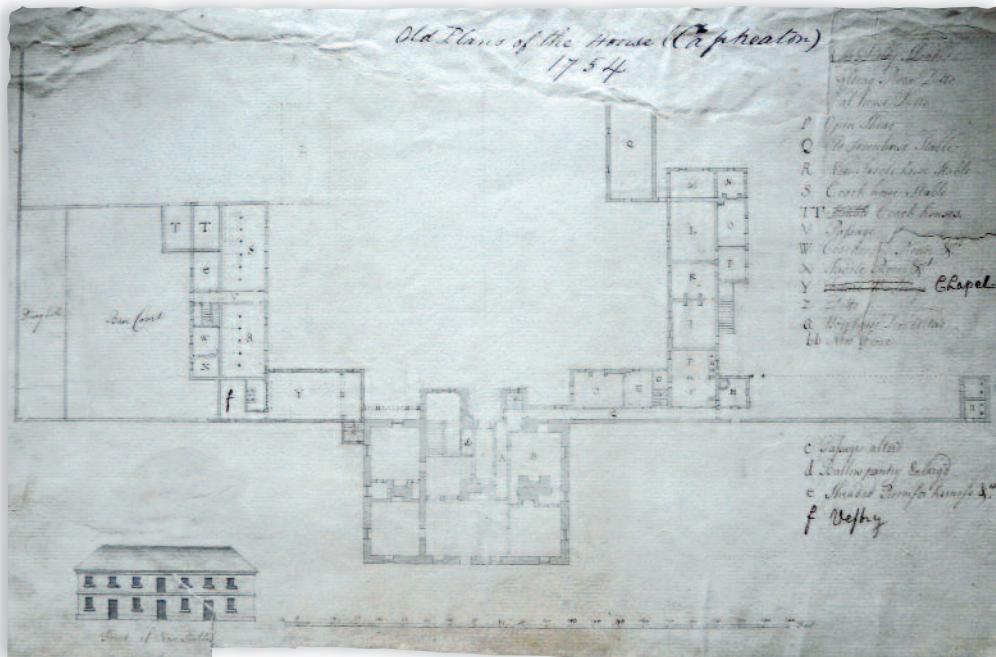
Capheaton Hall: proposal plan, captioned 'Old Plan of the House (Capheaton) 1754'
